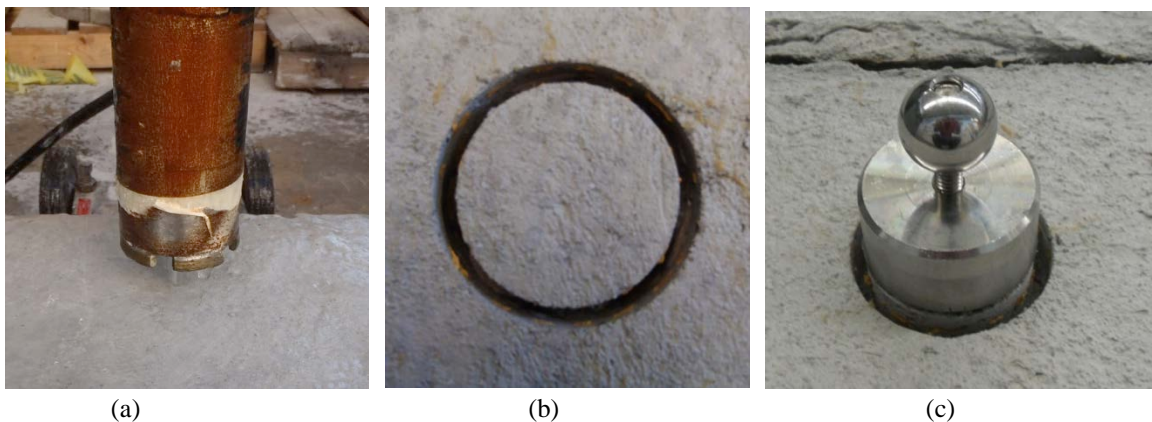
Pull off test: a) drilling instrumentation; b) circular embedded cut; c) attached steel disk
